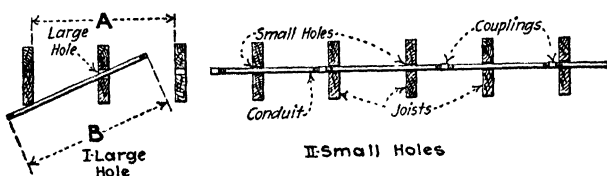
Showing how rigid conduit can, when it must, be run through holes in centers of joists.
